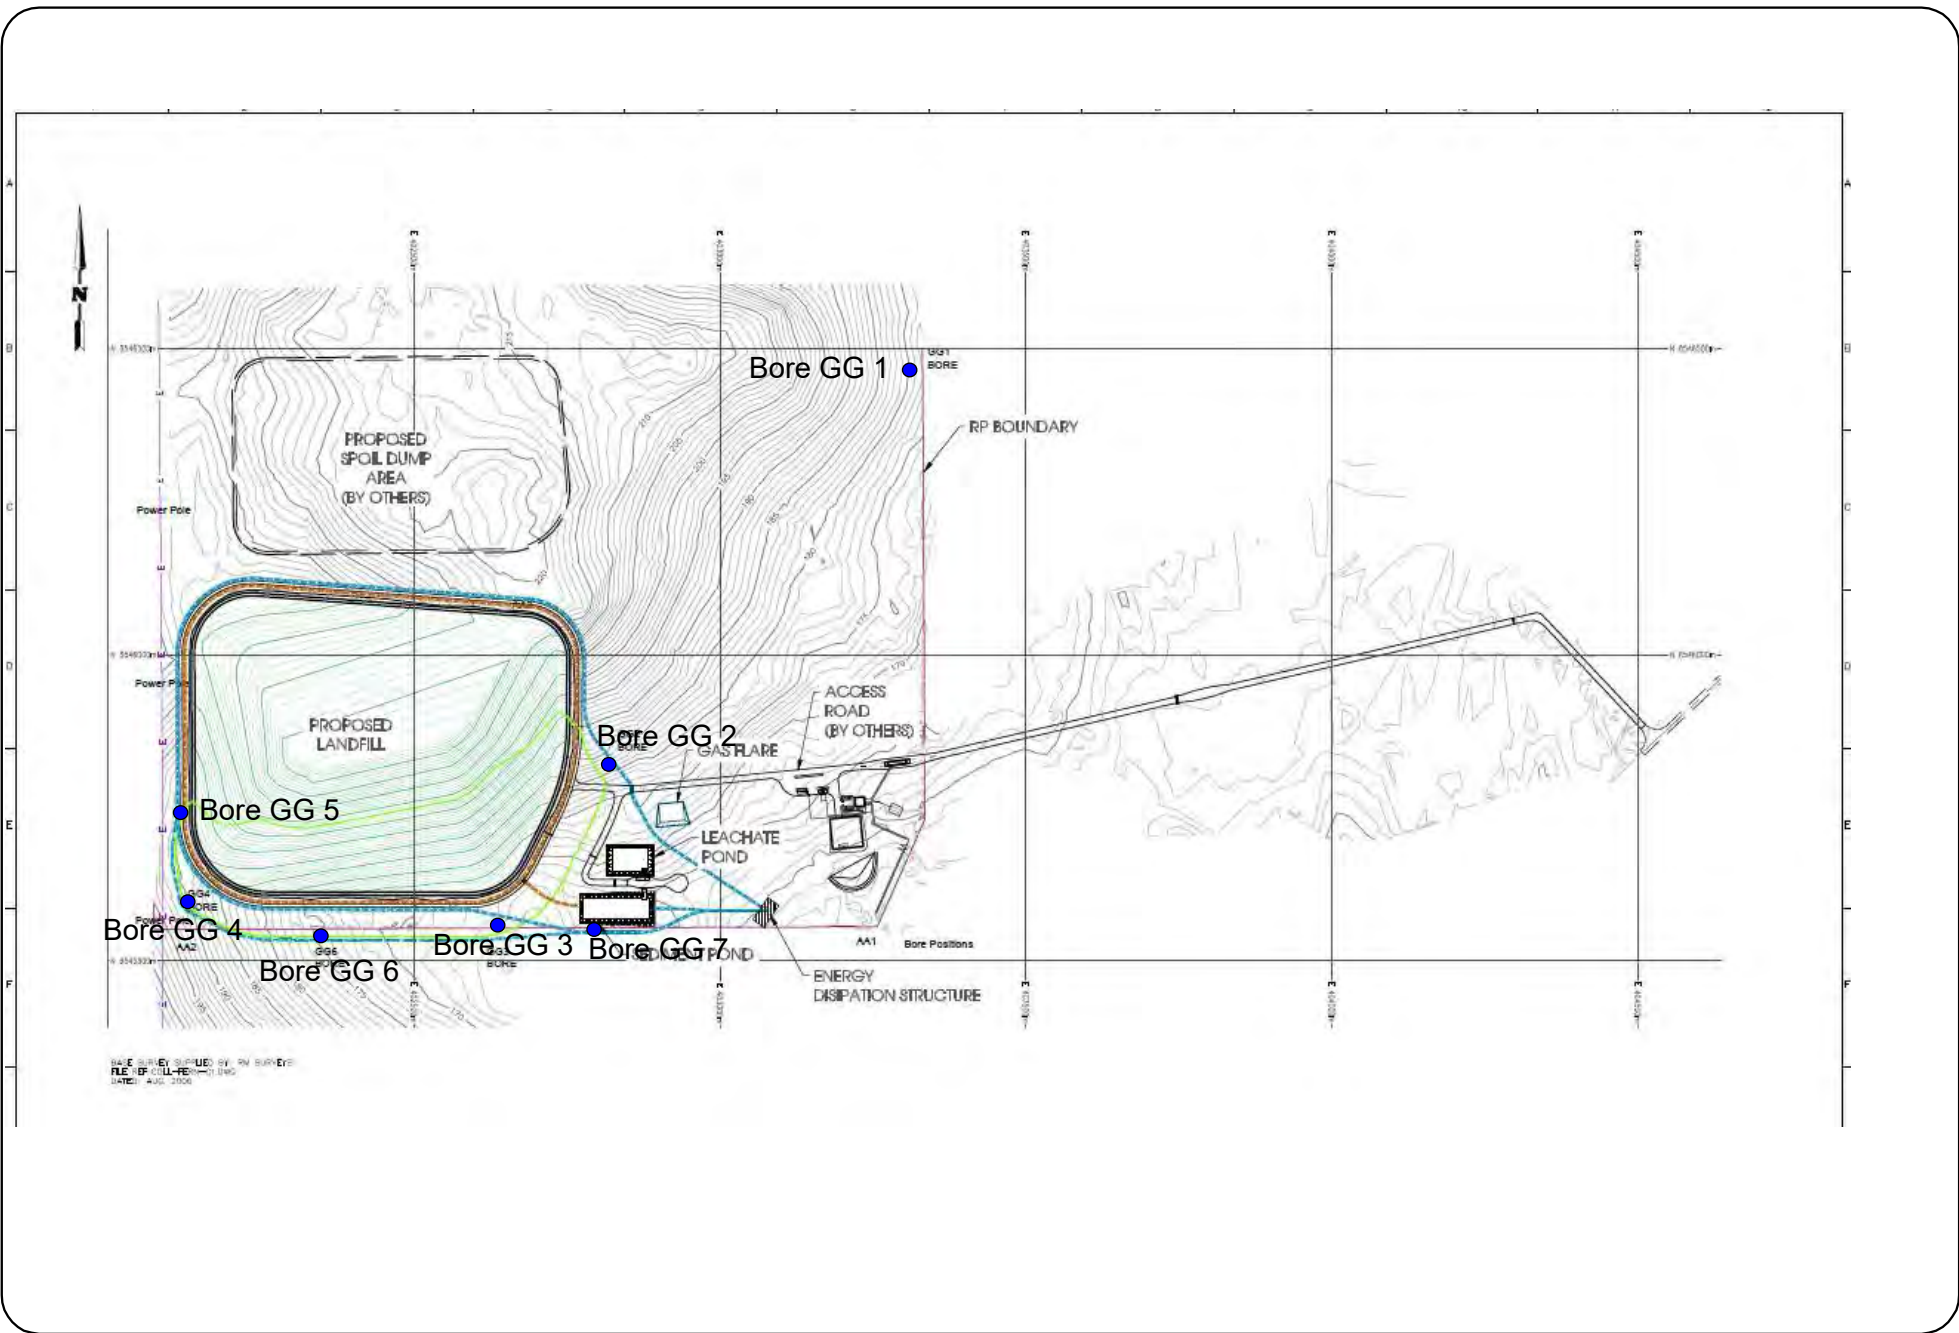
Site Plan of Proposed Landfill showing bore locations
